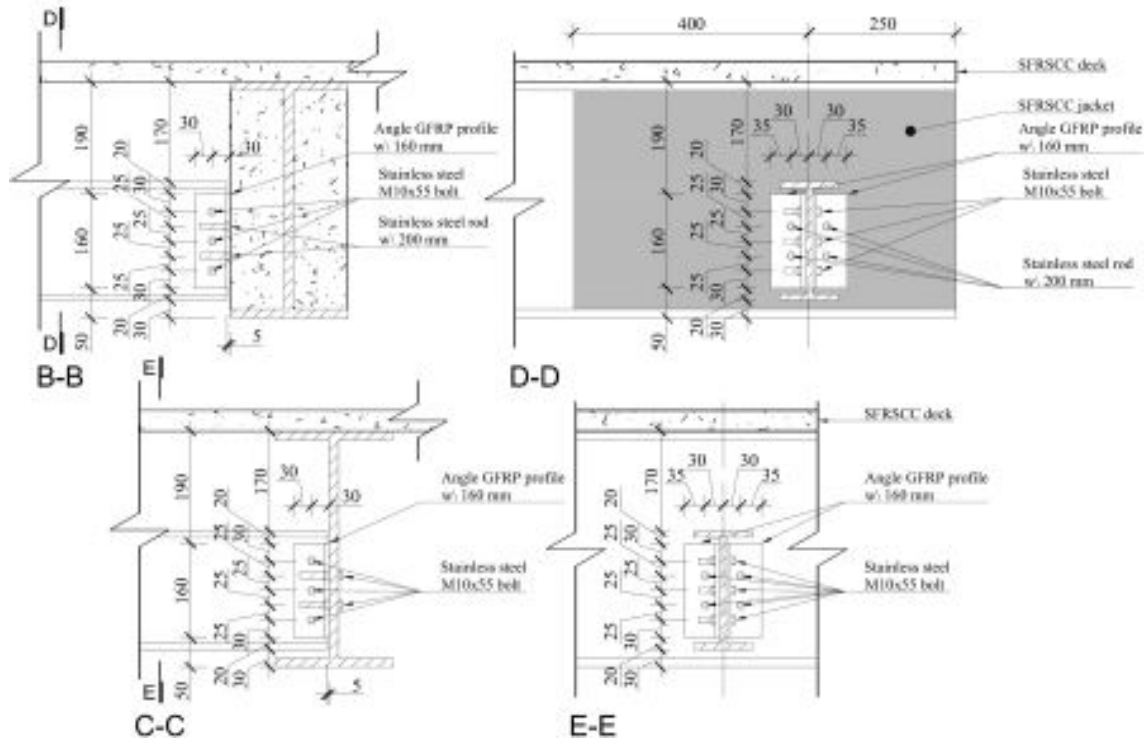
Details of the connections between main and secondary girders of the full-scale prototype.
